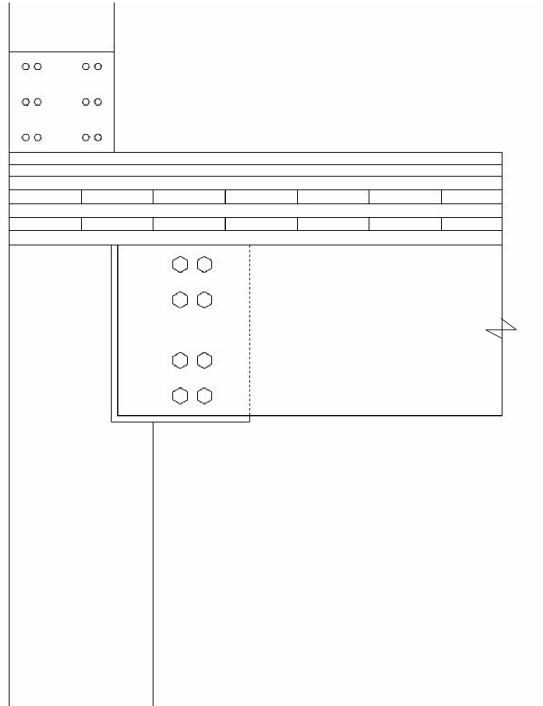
4.3) Cast-in-Place Concrete with Glulam Beams. Upper: side view; Lower: section view.
